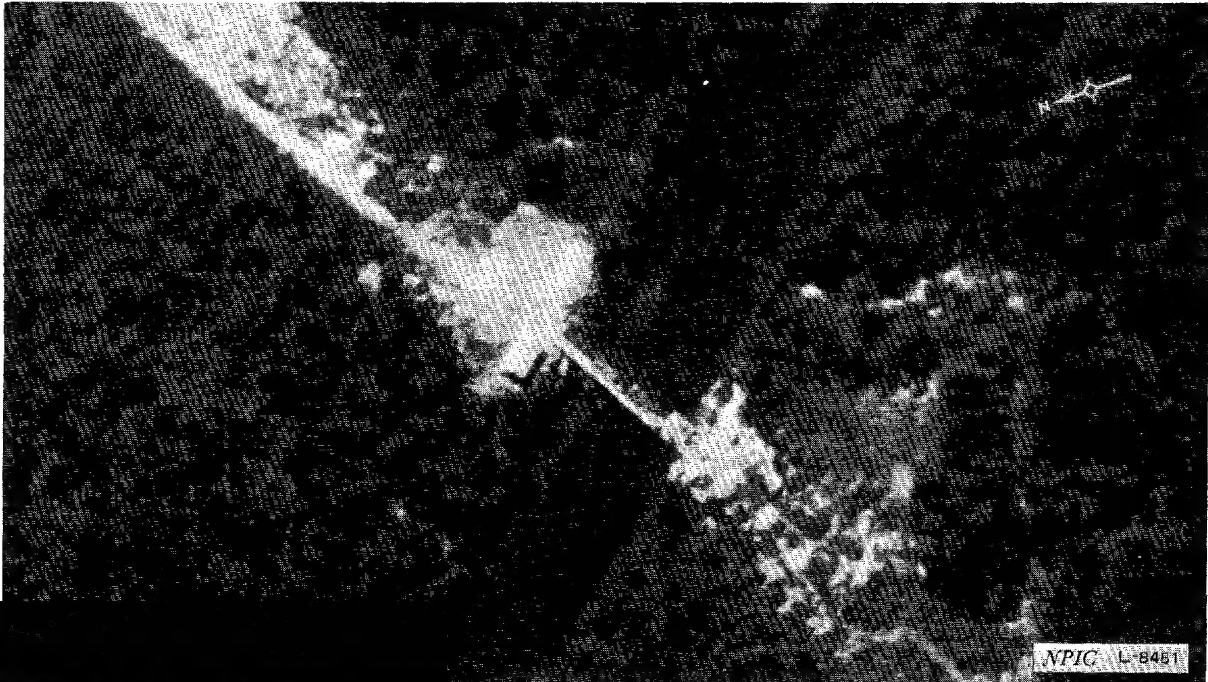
SMALL RAILROAD BRIDGES UNDER CONSTRUCTION, PHNOM PENH/SIHANOUKVILLE RAIL LINE, CAMBODIA
